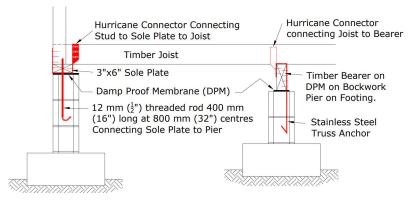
TIMBER BEARER ON MASONRY PLINTH
